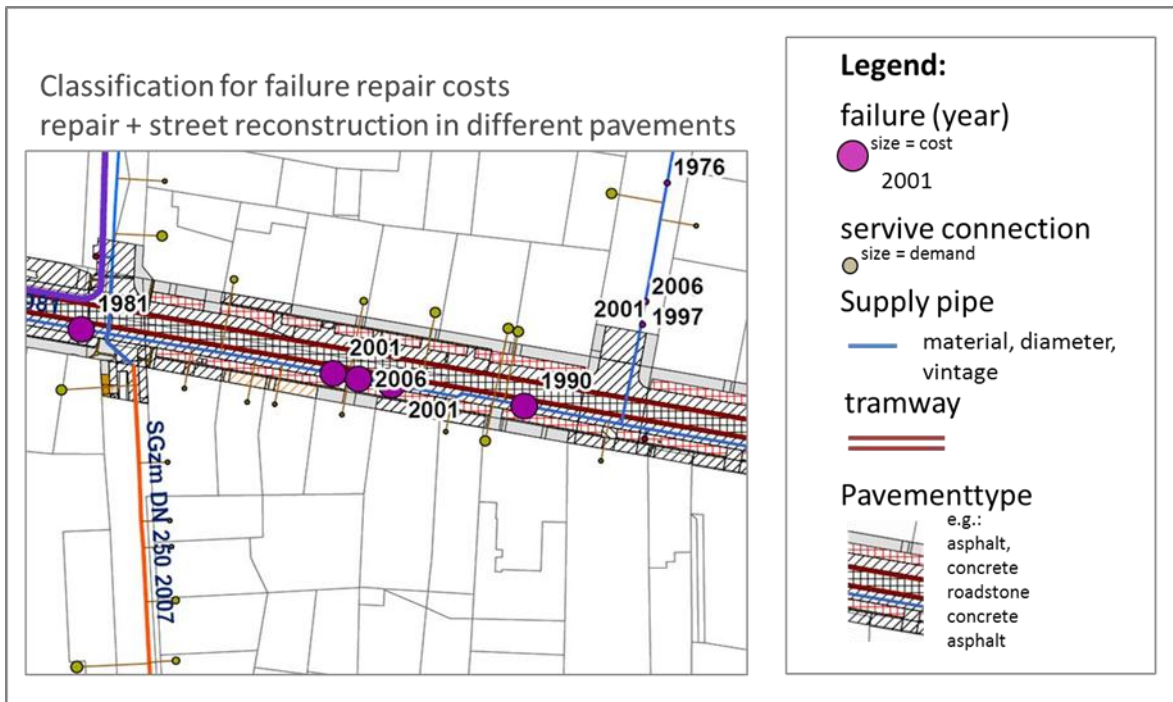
Detailed failure cost specification based on street and pavement type and repair type
